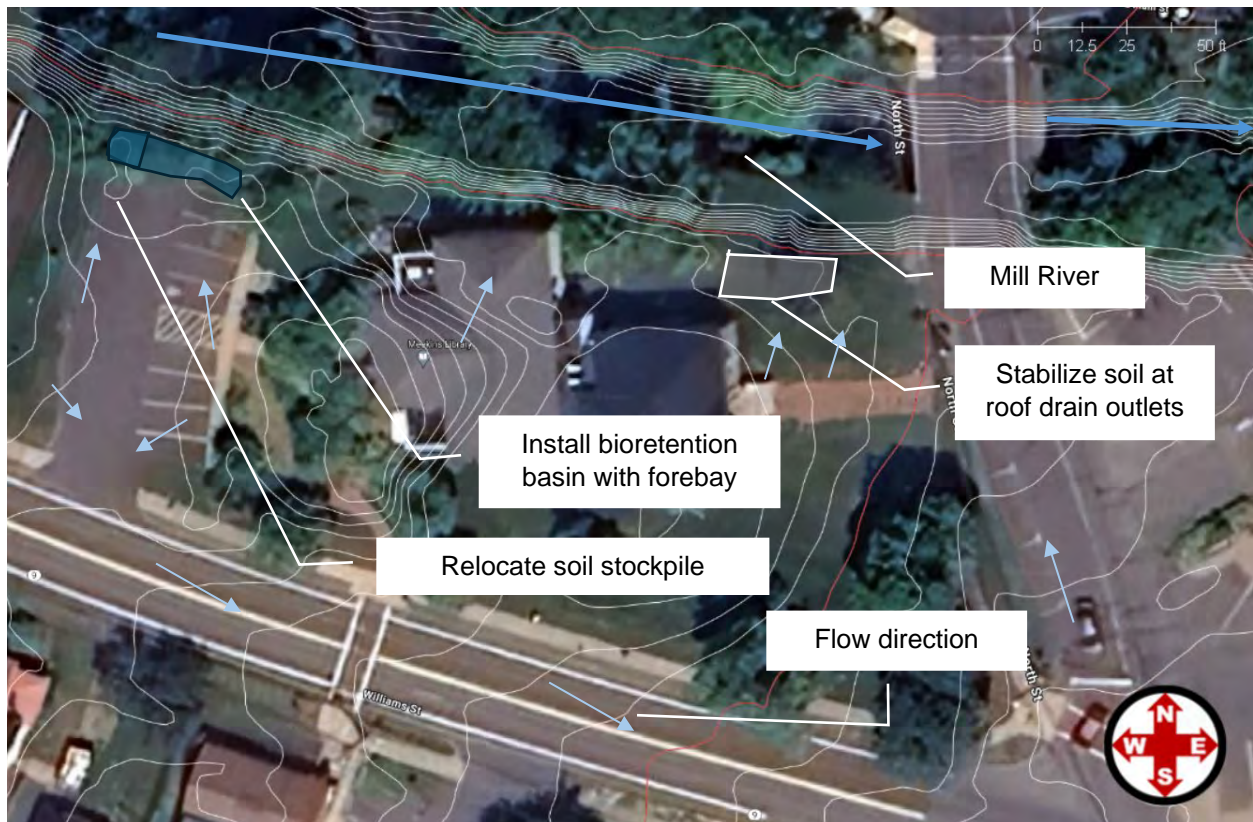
Proposed bioretention basin and drainage improvements around Meekins Library
